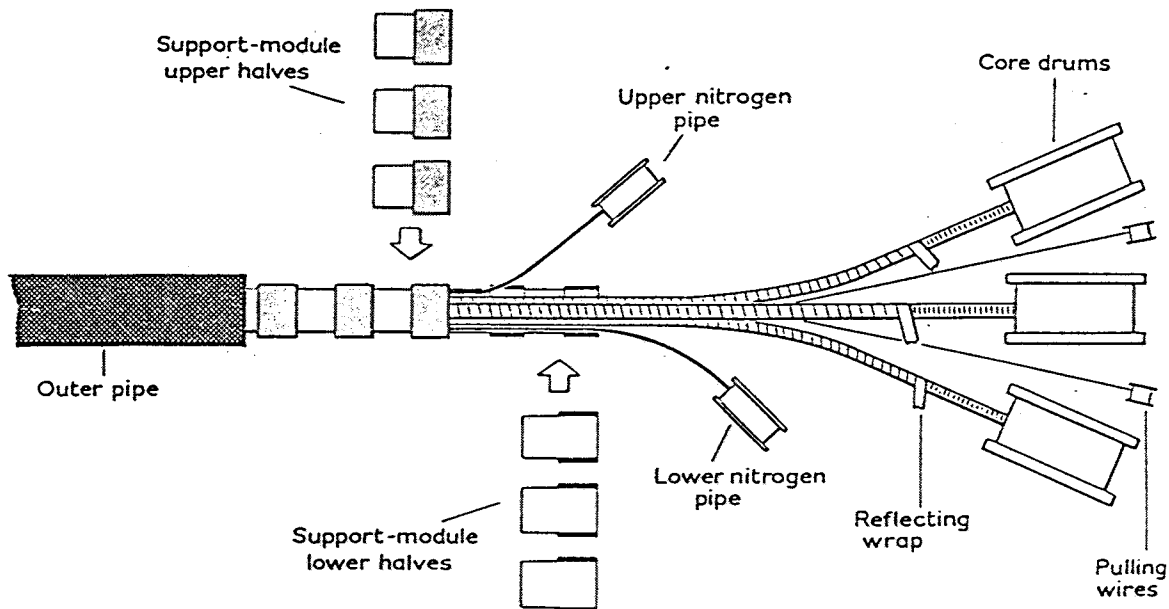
On-site installation plan for superconducting cable system<sup>68</sup>.
